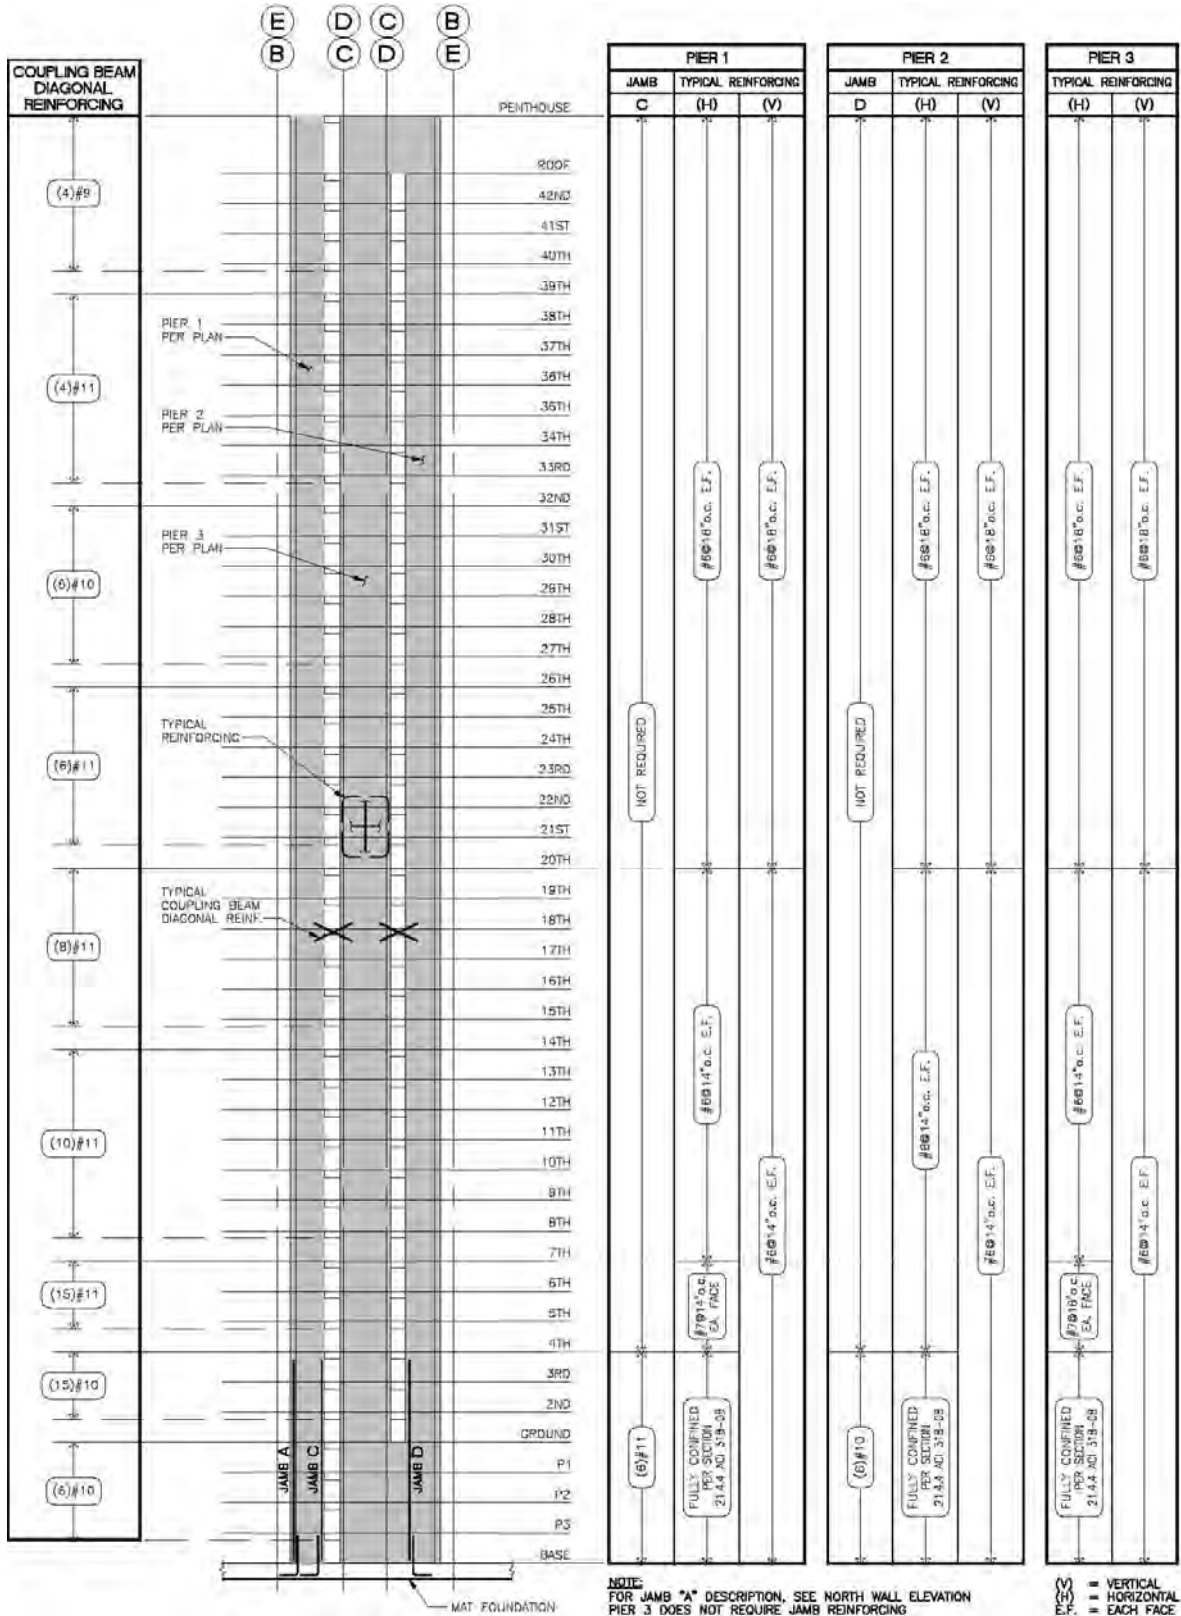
Elevation A and shear wall reinforcing for building 2A
